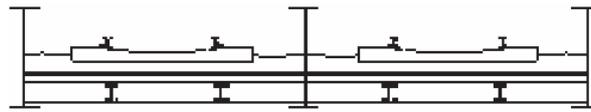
Half-through plate girder bridge, with cross girder, floor plate, rail bearers and ballast.
